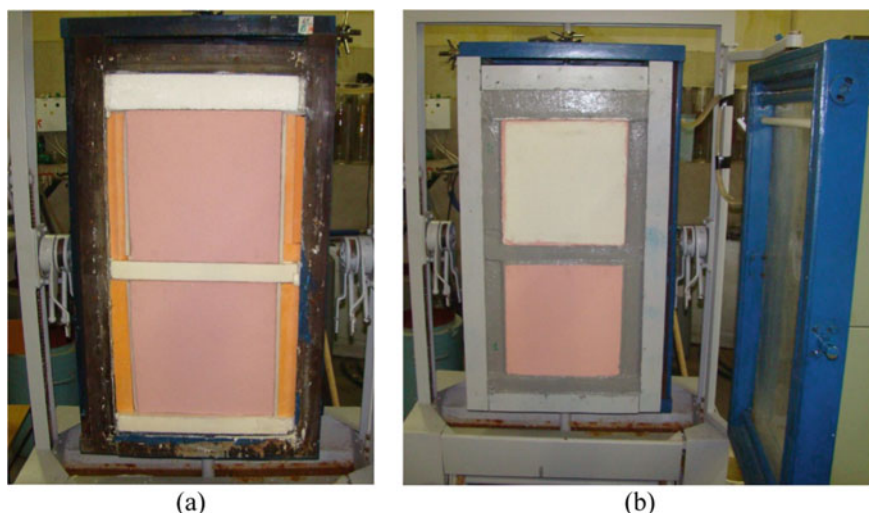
Testing of fragments of concrete slabs with applied compositions of cladding and decorative systems on a concrete base a and on ceramic tiles b, in a refrigeration and sprinkling installation XDU-02 “Thermoisolation”
